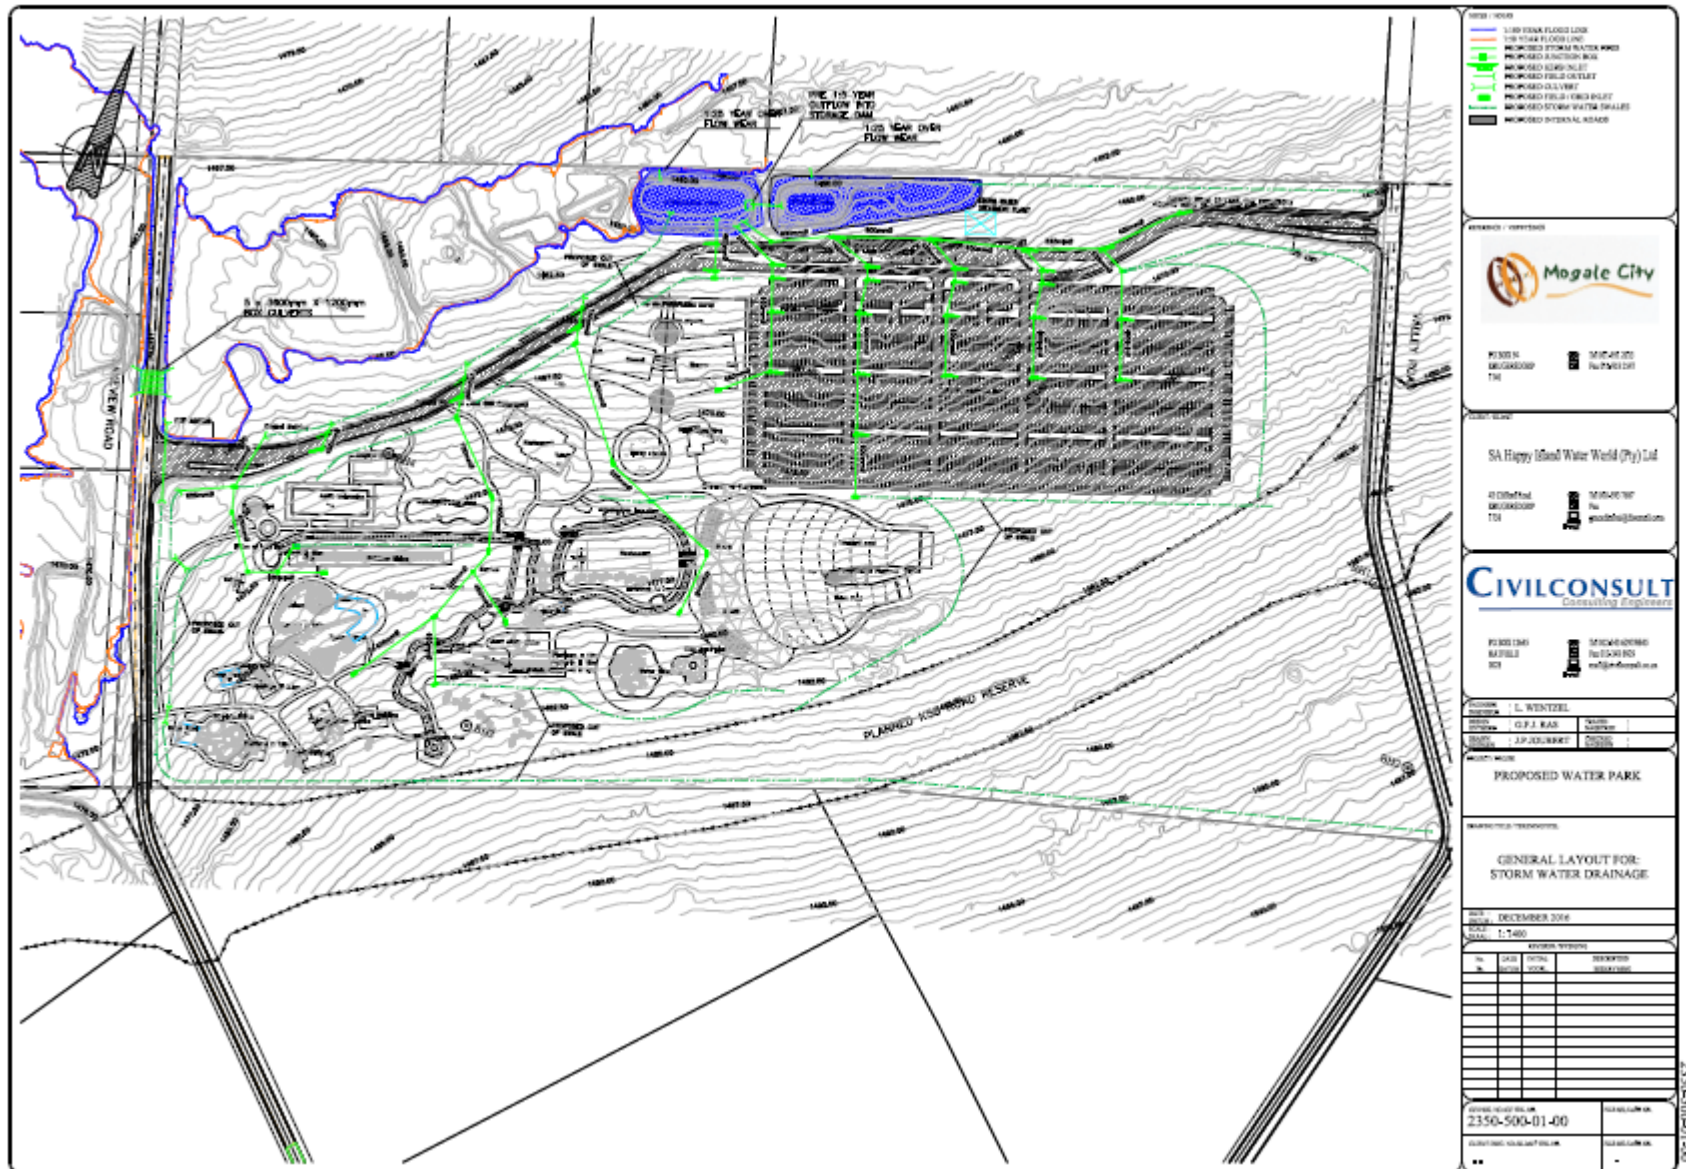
Internal entry and exit roads, parking and associated stormwater
